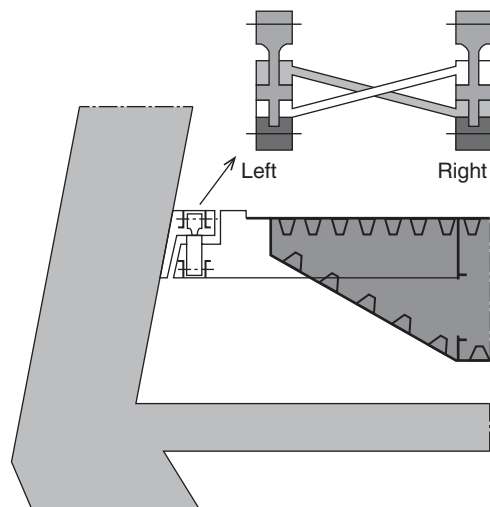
Connection between the deck and the pylon through vertical sliding bearings for transmission of lateral forces
